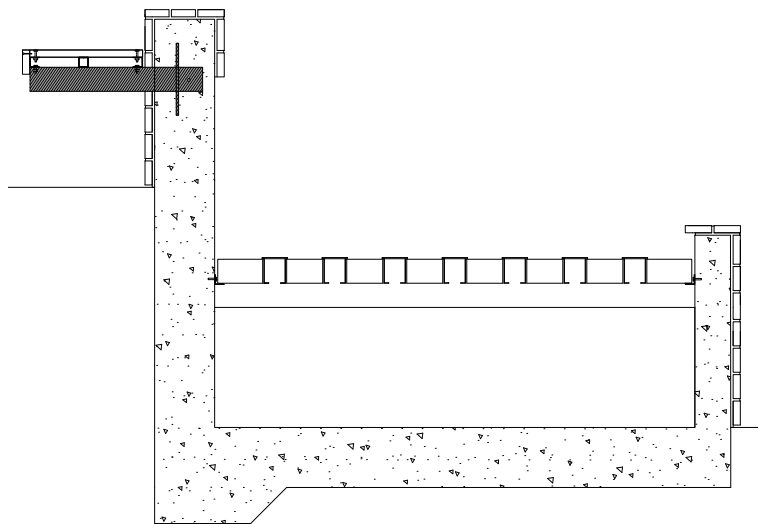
Construction detail of hydroponic bed with raft construction and incorporated seating. (Author, 2015)
